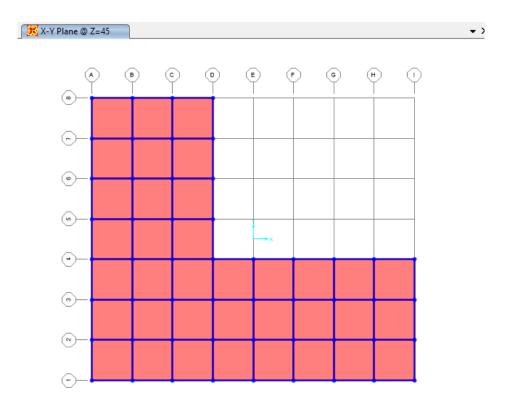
(a) plan of setback model 3 (L-type) up to 45 m height
